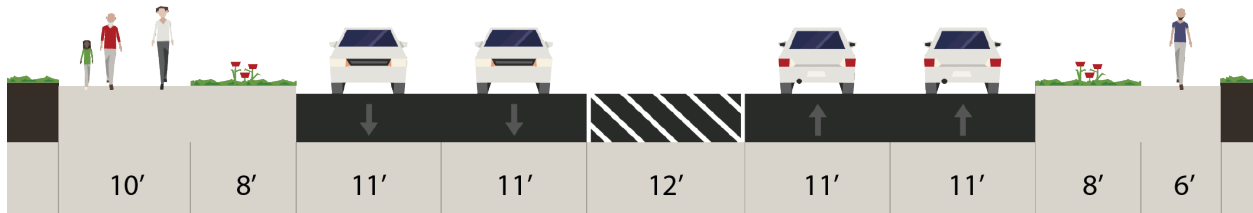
River Road Level 2 Evaluation, Typical (150') Section
